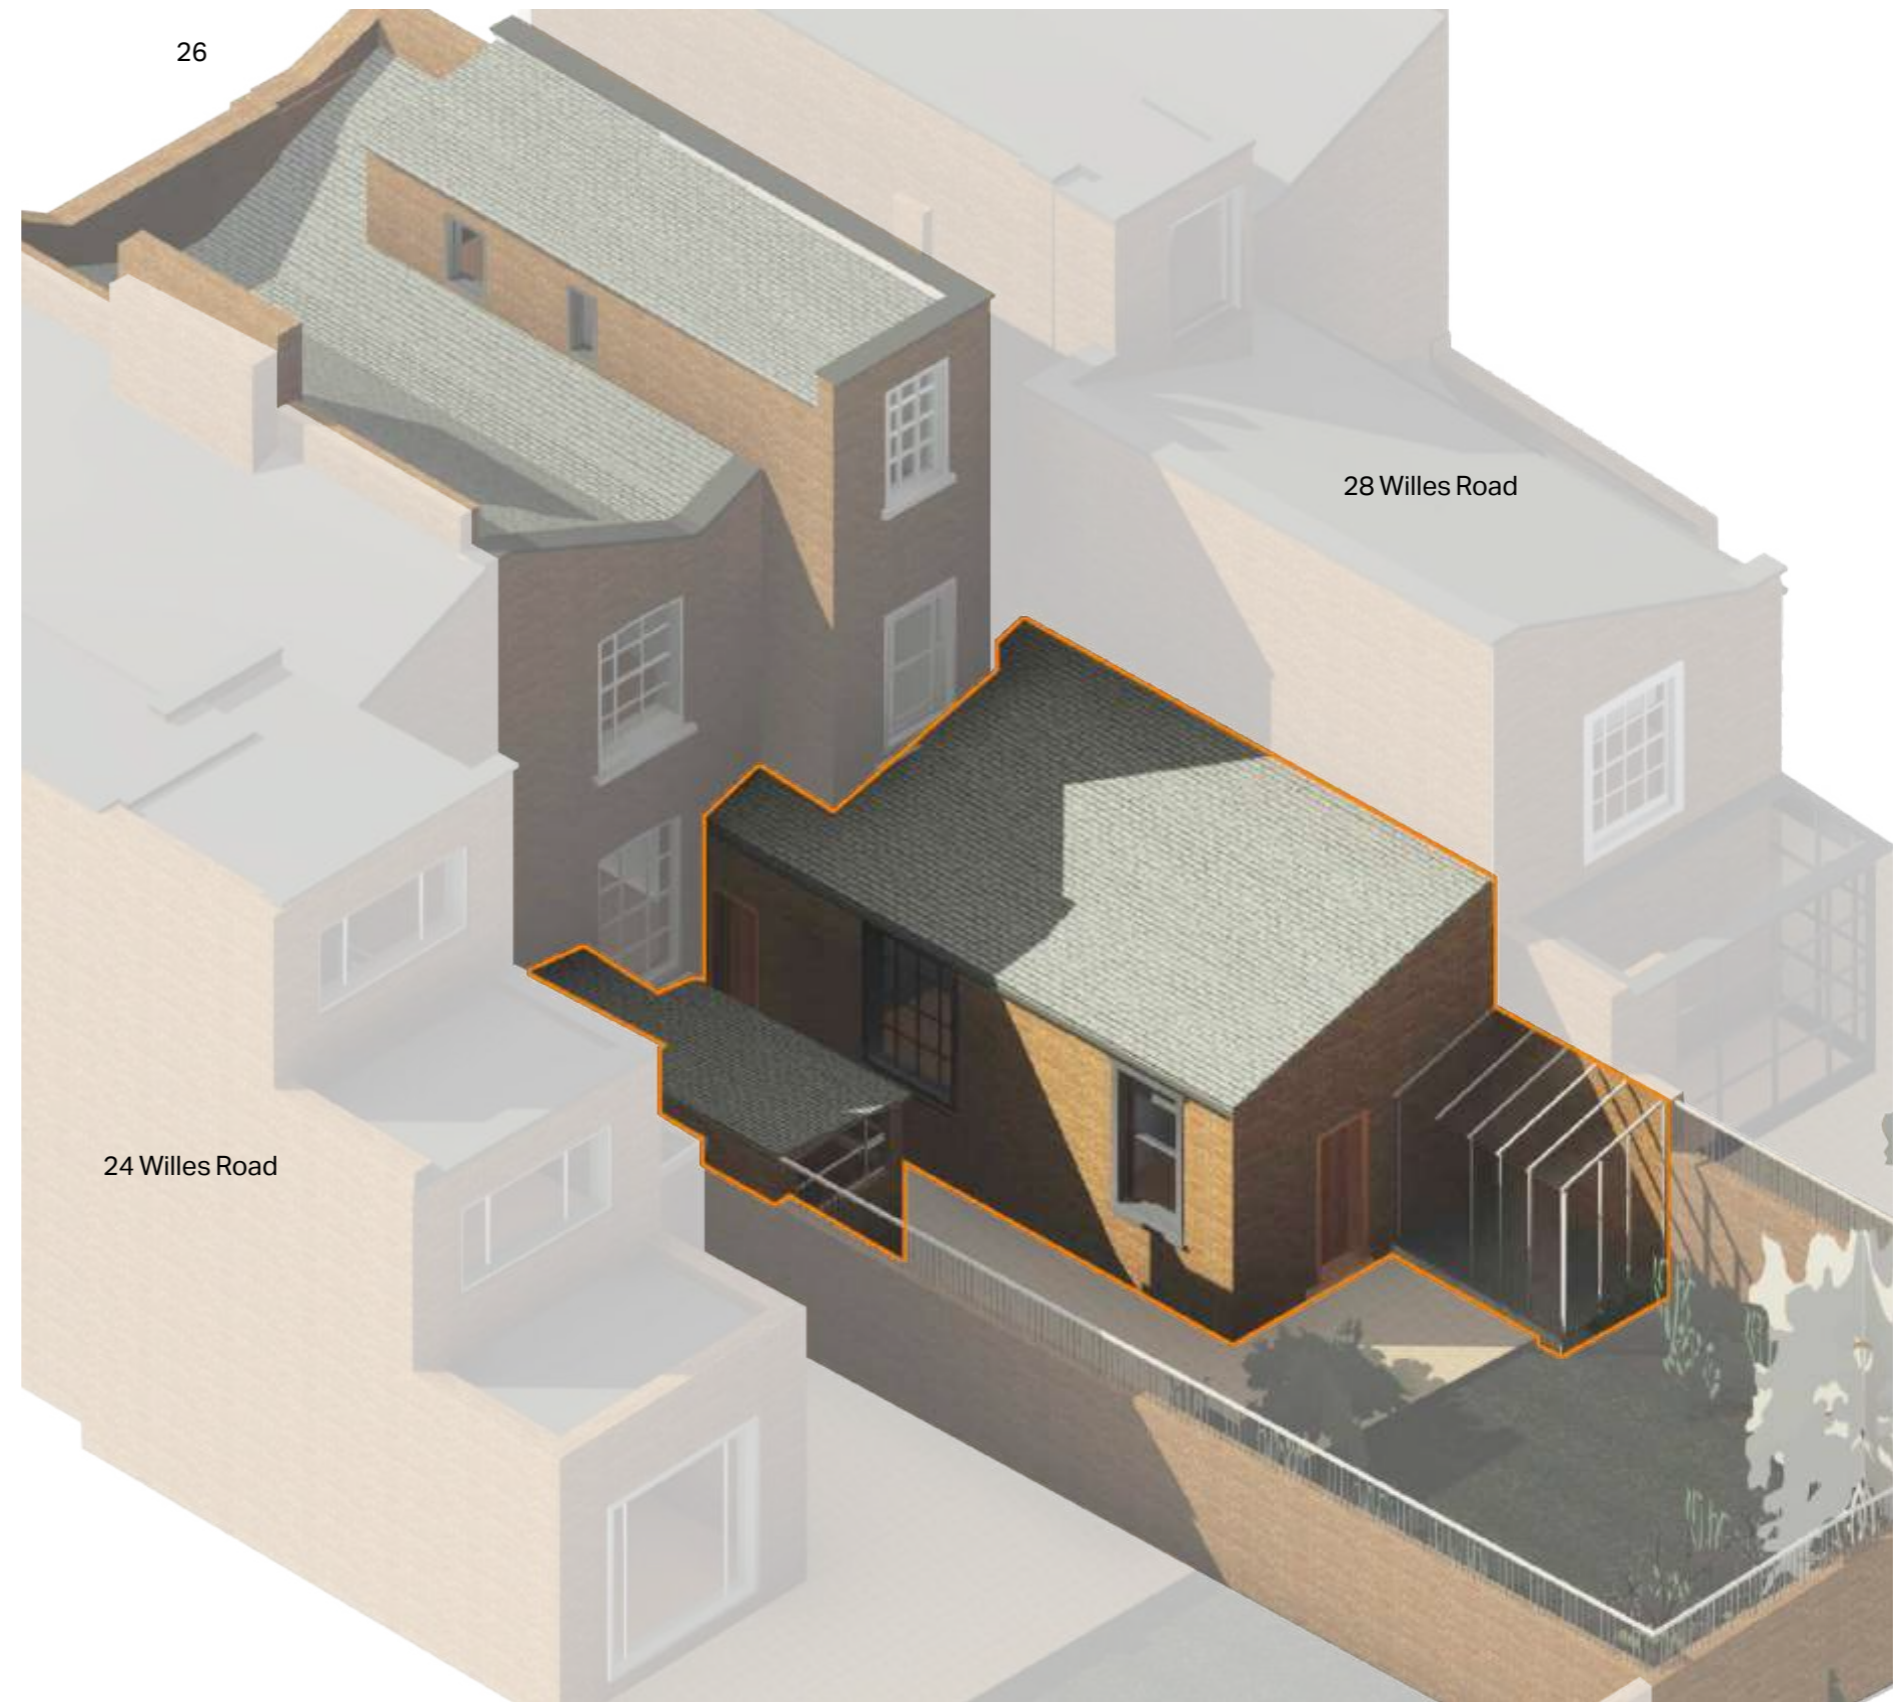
Axonometric model of garden frontage of existing house, viewed from east
